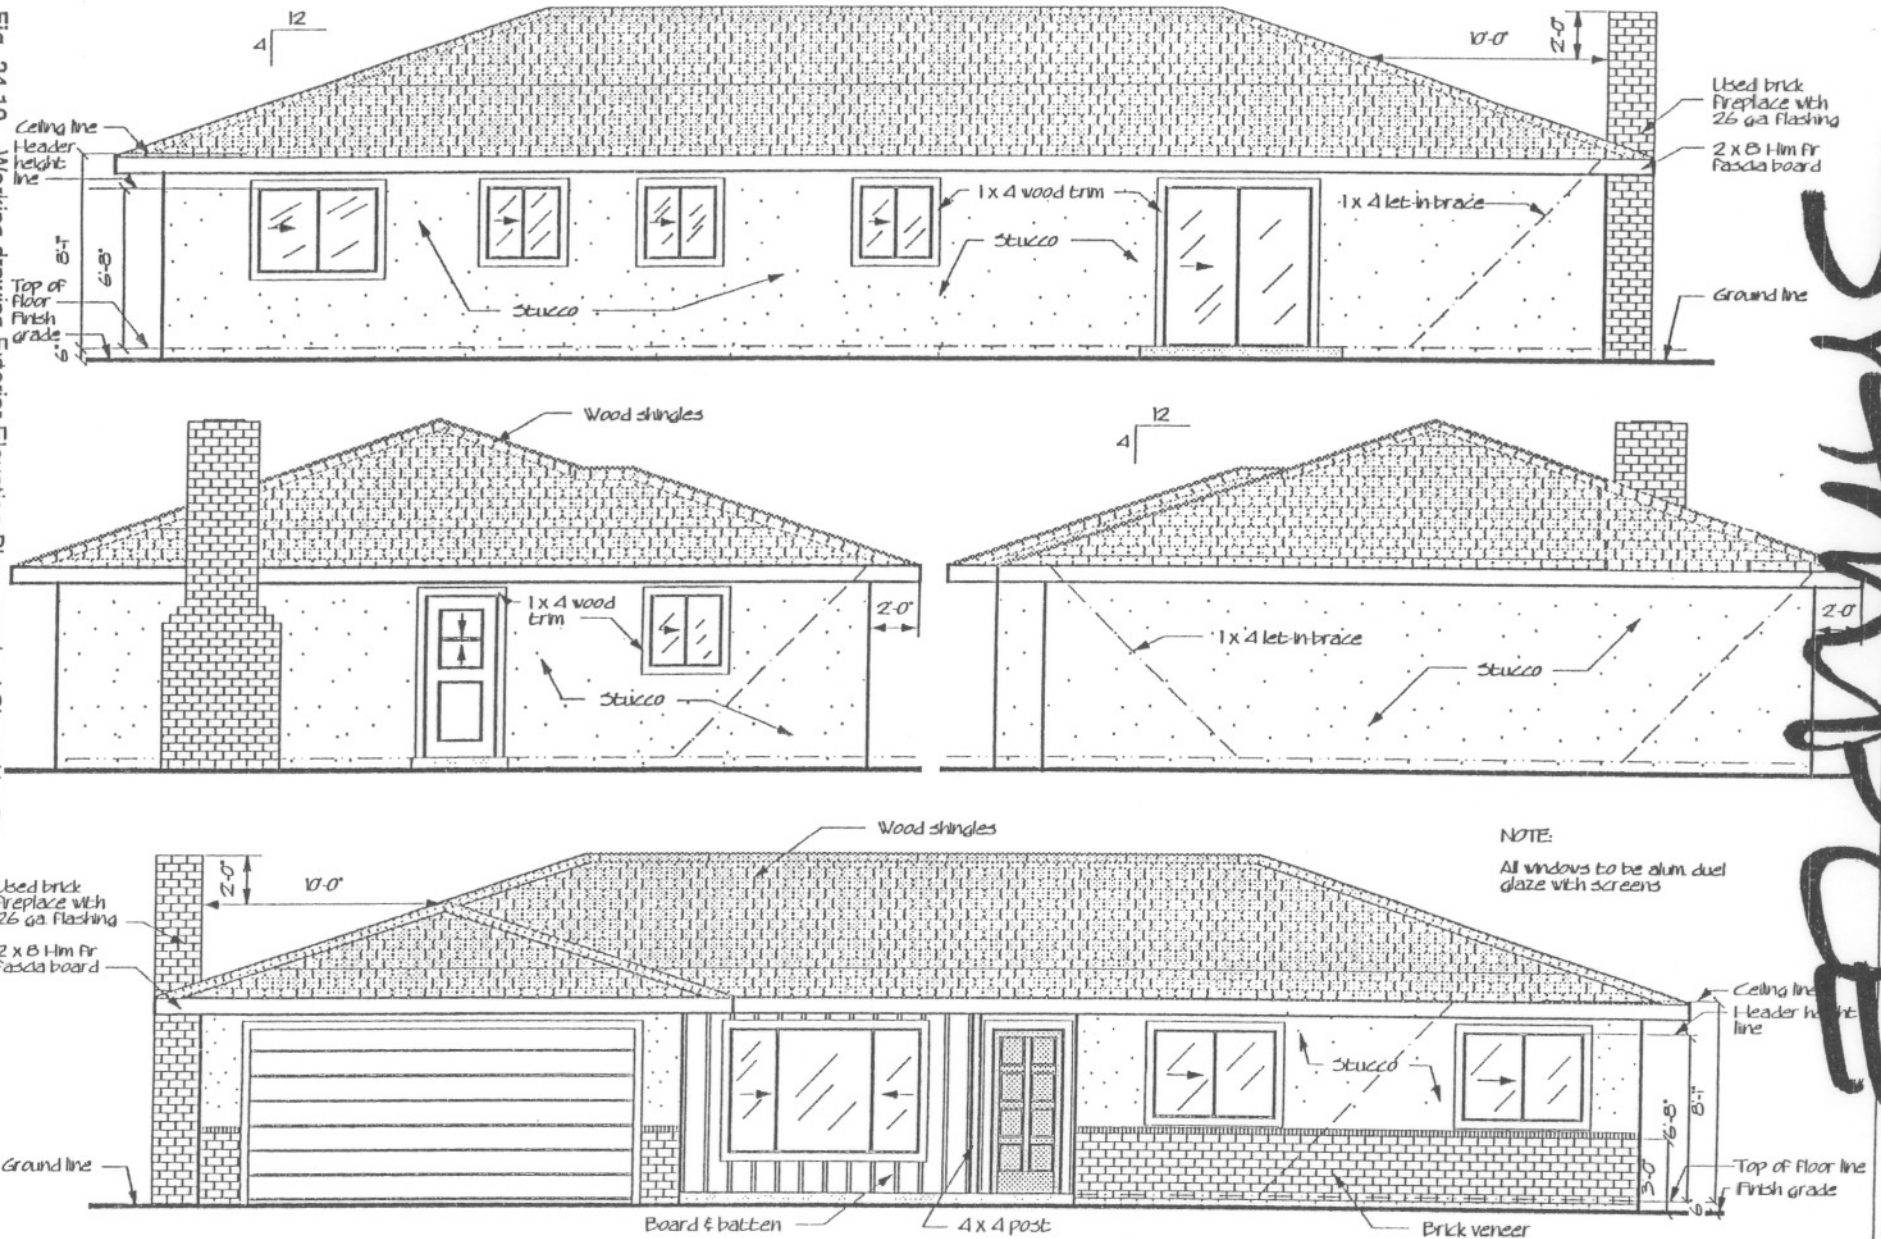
Working drawing Exterior Elevation Plan sample. (Sheet No. 3)
